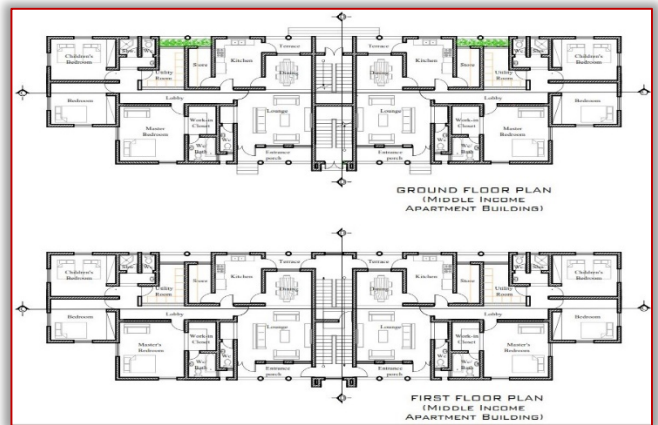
Ground and 1st floor plan for middle income earners' apartment building
